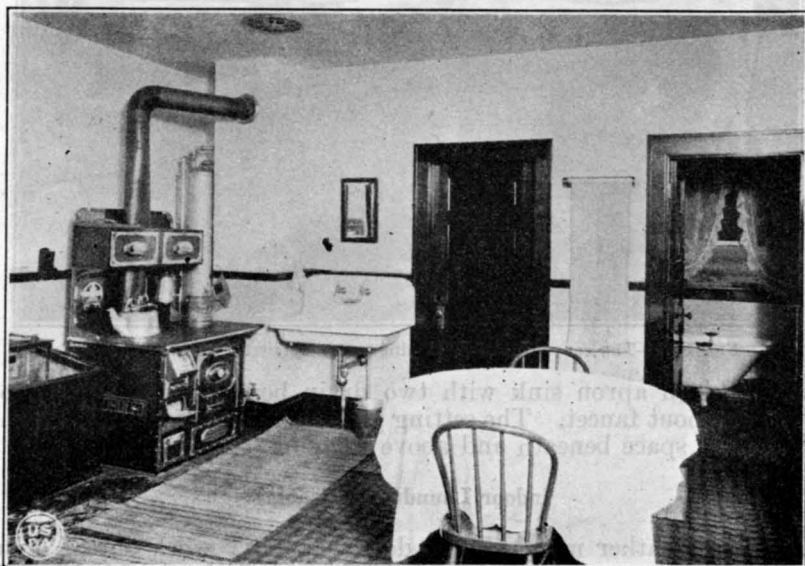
A typical farm-plumbing installation, showing part of the kitchen and bathroom
